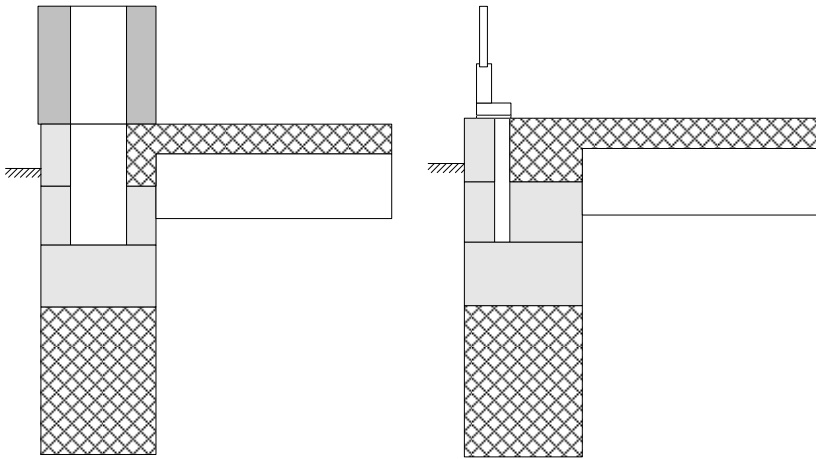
Sections of a joint between the outer wall/foundation/slab-on-ground respectively door/foundation/slab-on-ground
